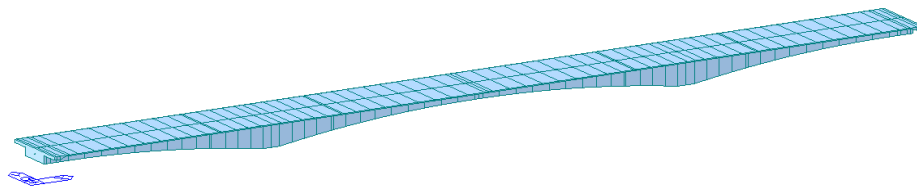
Computational structural model of the prestressed concrete continuous girder bridge
